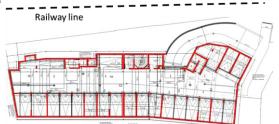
Example of building configuration next to a railway line (horizontal layout) [4]
